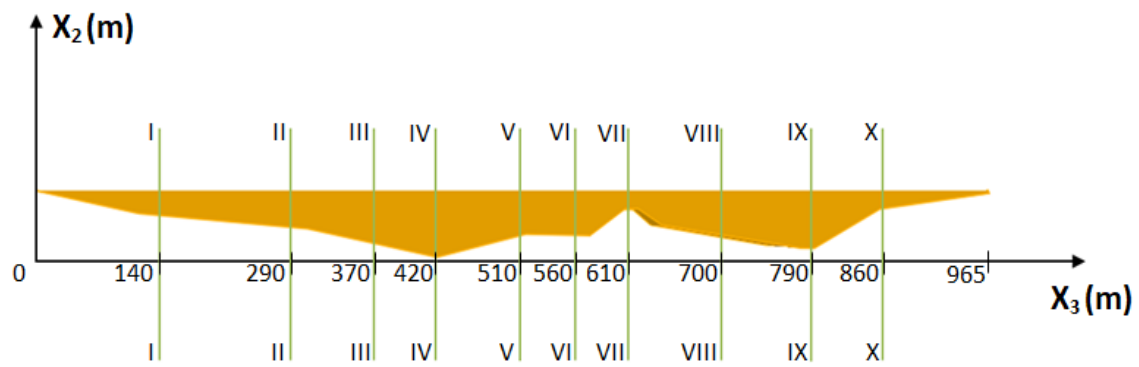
Layout of characteristic cross-sections of the Dzhidalisy Dam
